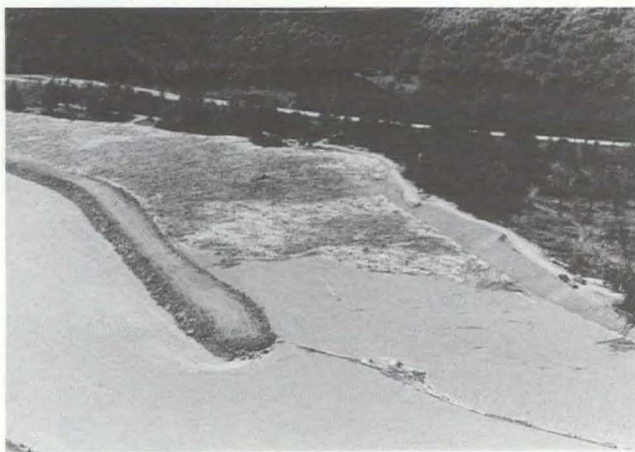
Fraser River Debris Trap. (D.L. Cooper photograph)
